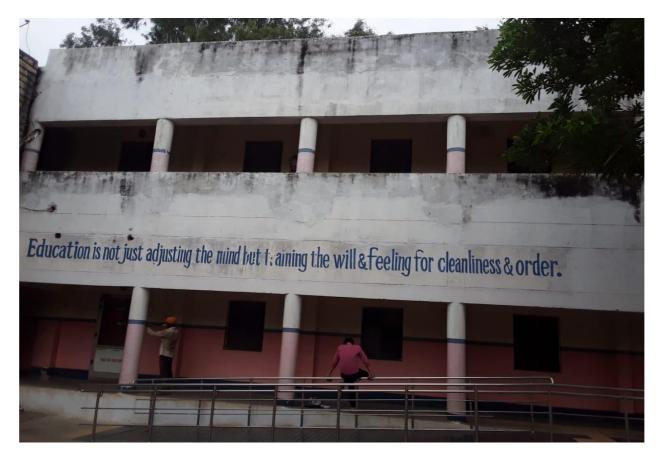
Front Elevation of the KV-1 block C (primary department) building Neemuch
